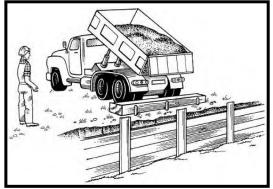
Stop blocks to prevent dump trucks from sliding into the excavation when unloading in reverse.
